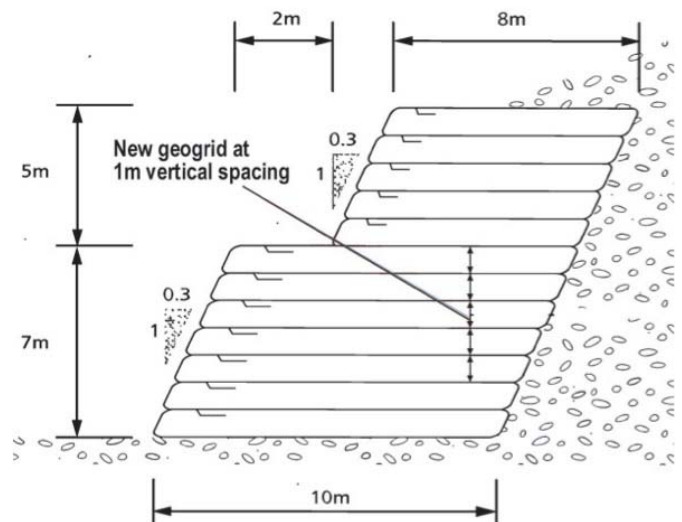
Cross section through reinstated slope at Wan Li, Taiwan.
